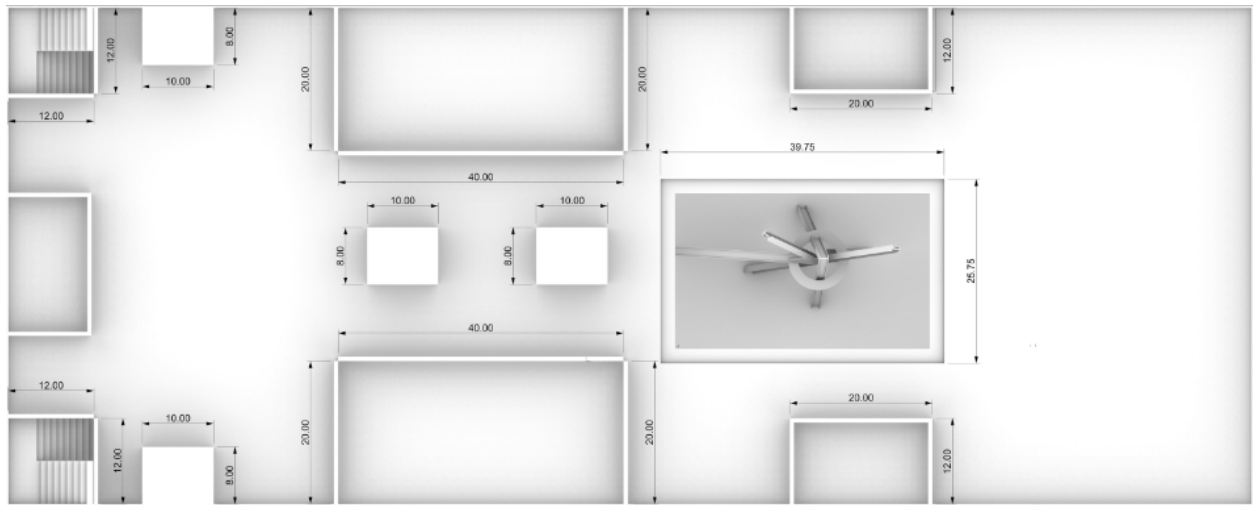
Rendered Floor Plan of the Ground Level with clocknot and space for a food court.
